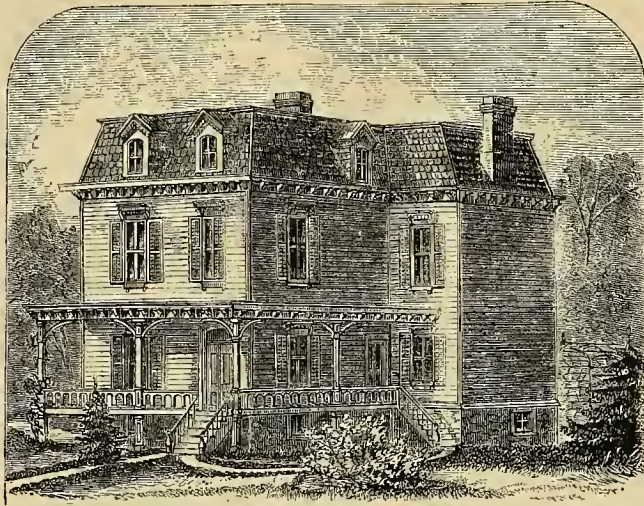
FRONT OR SOUTH-EAST ELEVATION.
